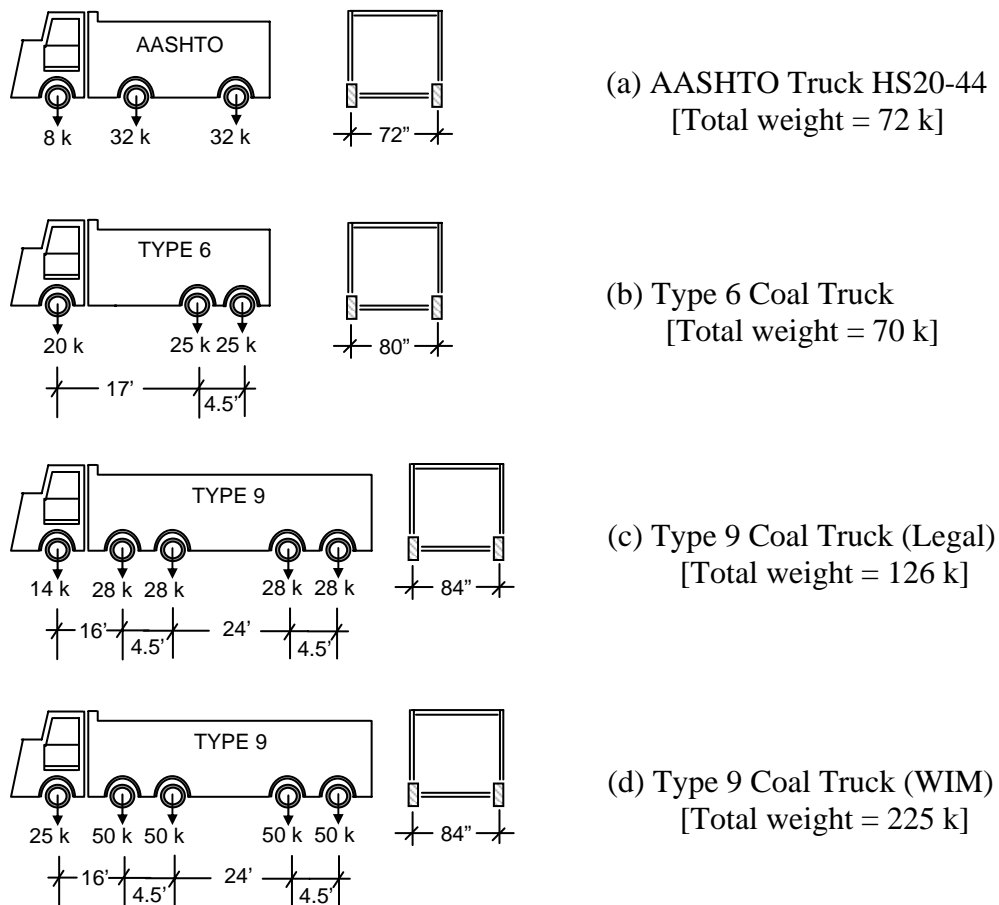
Truck type and loading that cross the Louisa-Fort Gay Bridge.
